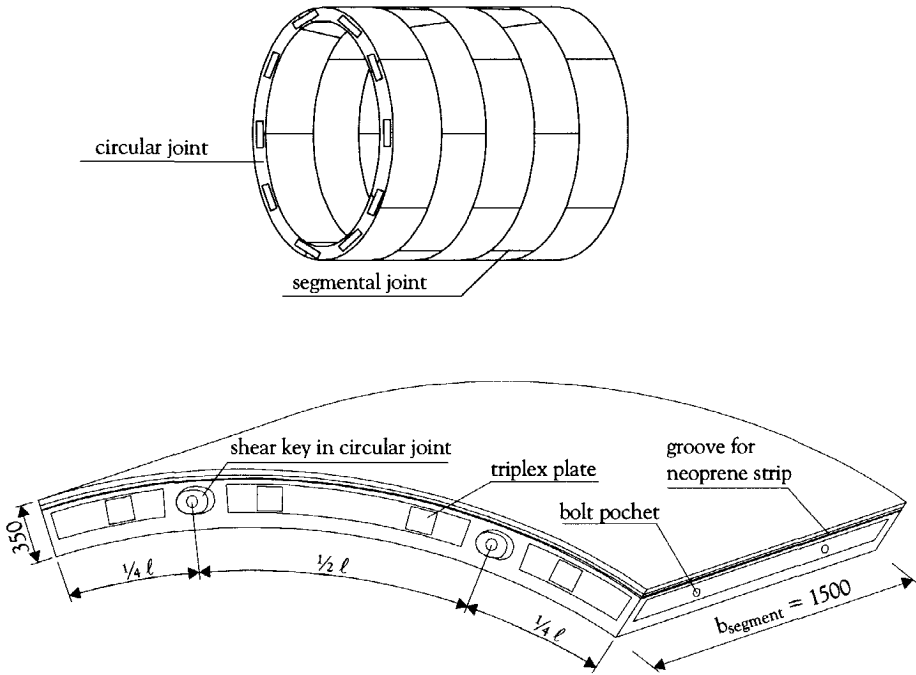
Shear keys as circular joint connection between tunnel rings
